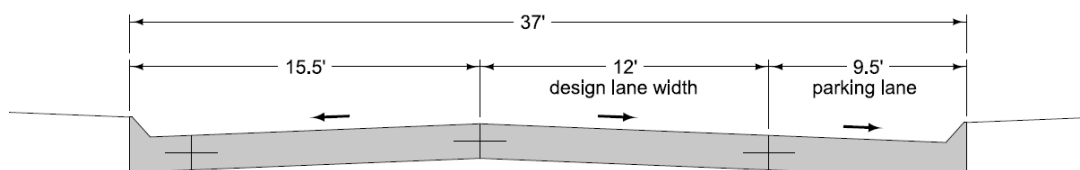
2-lane urban roadway with a parking lane and a standard paver width of 37 feet.
